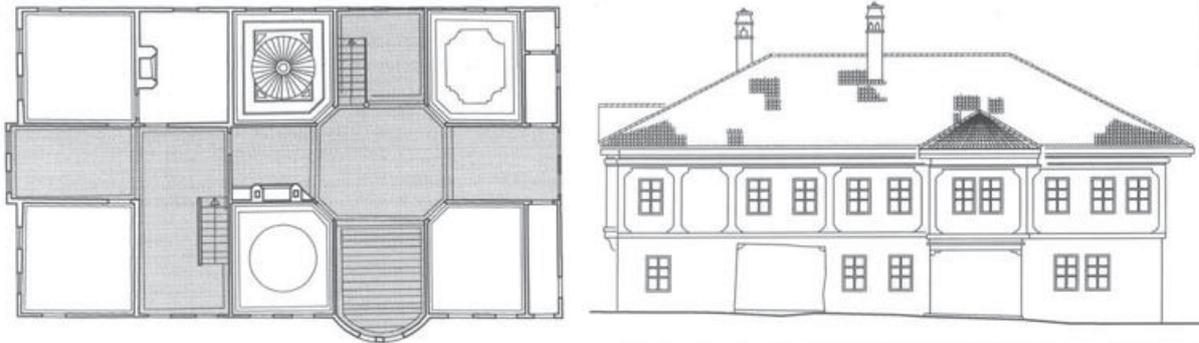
Plan layout of main living floor and facade of a Turkish House [10]
